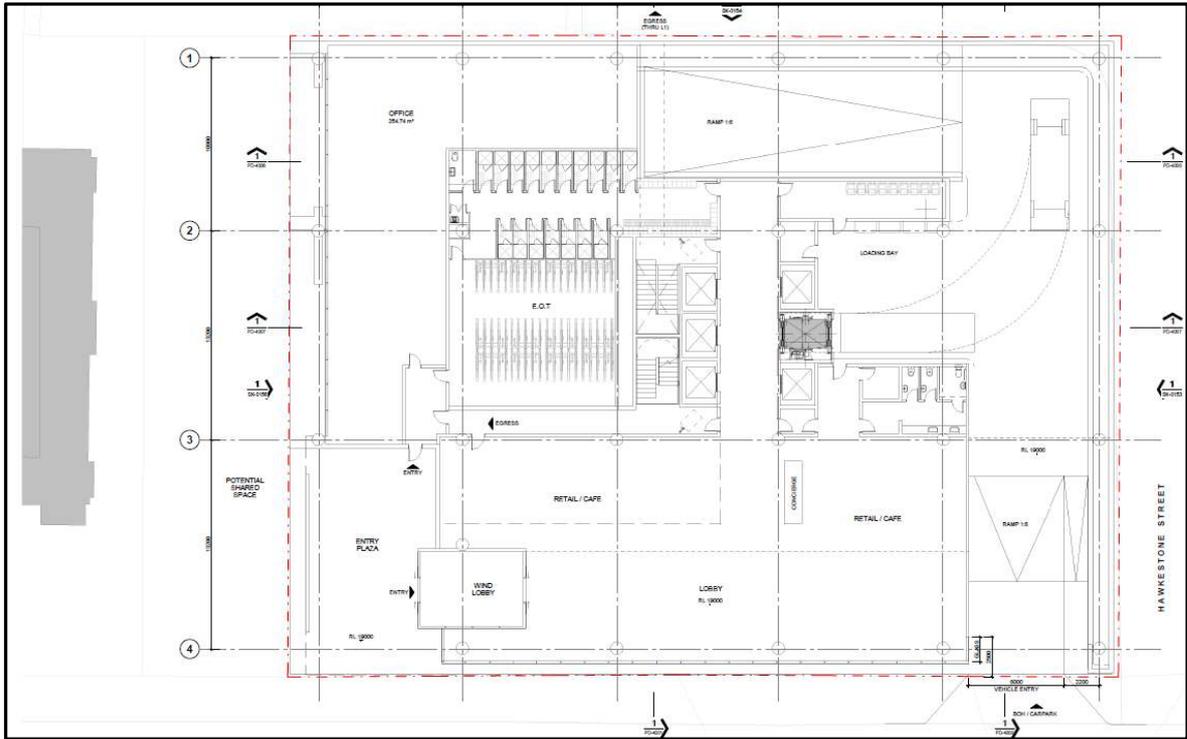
Ground Floor Layout (Source: Jasmax Architects)
